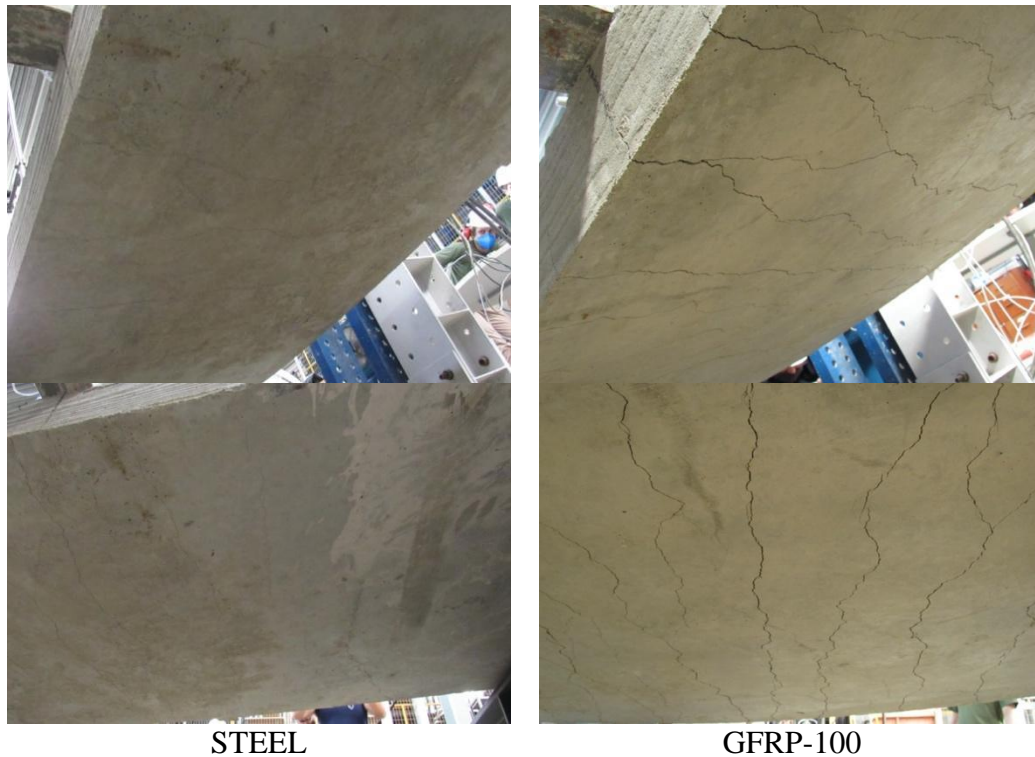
Crackd face of the steel reinforced slab and GFRP-100.
